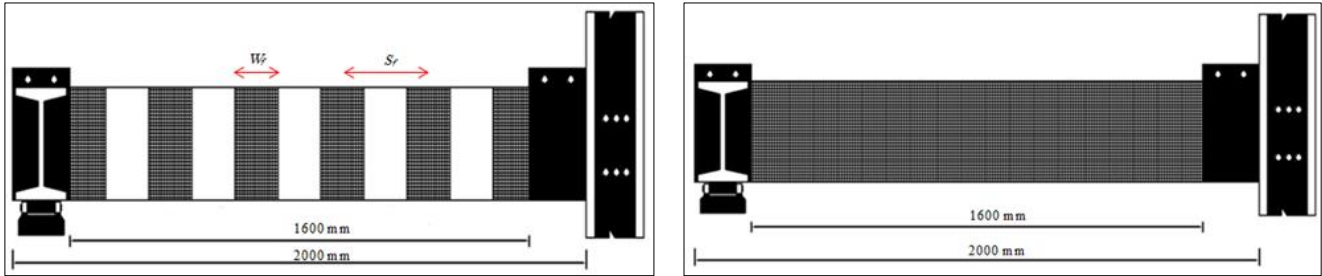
Beam Dimensions and Reinforcement Configurations (in mm)
